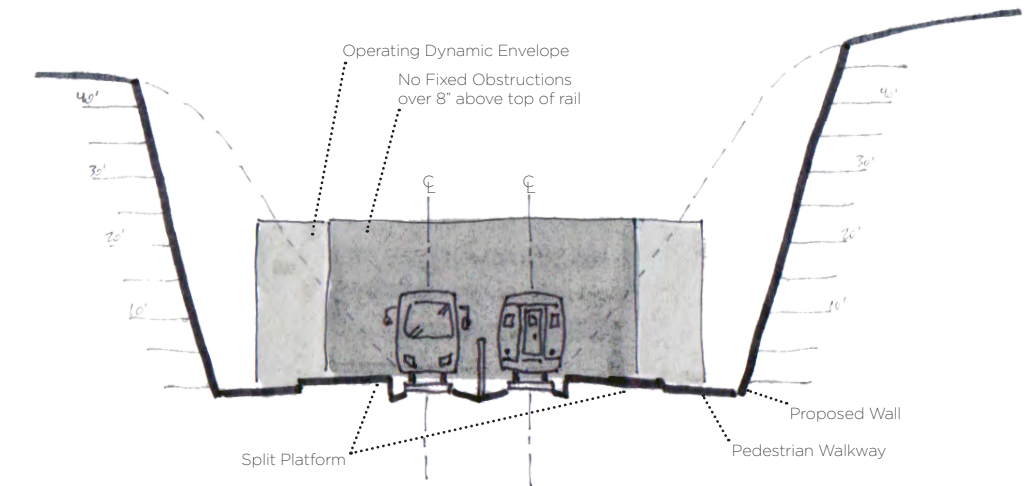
Proposed Walls Allow for Minimum Dimensions of the Split Platform
